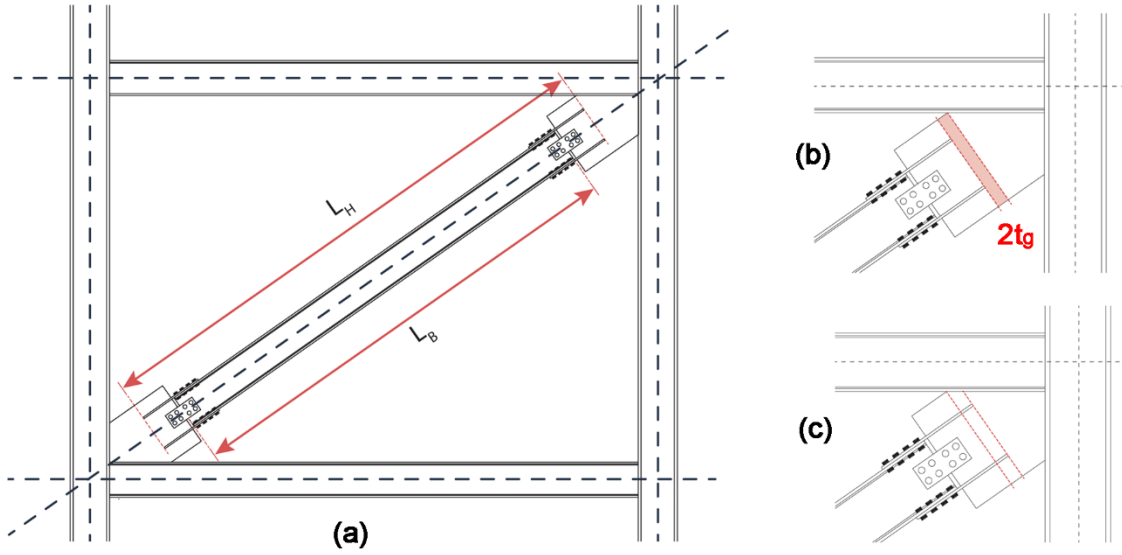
Gusset plate design with and without clearance in the flange plate connection
